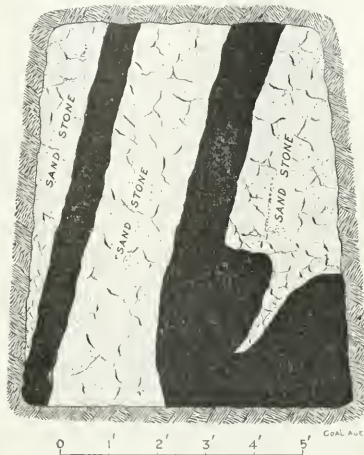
FACE OF TUNNEL, SHOWING COAL AND BROKEN SANDSTONE
